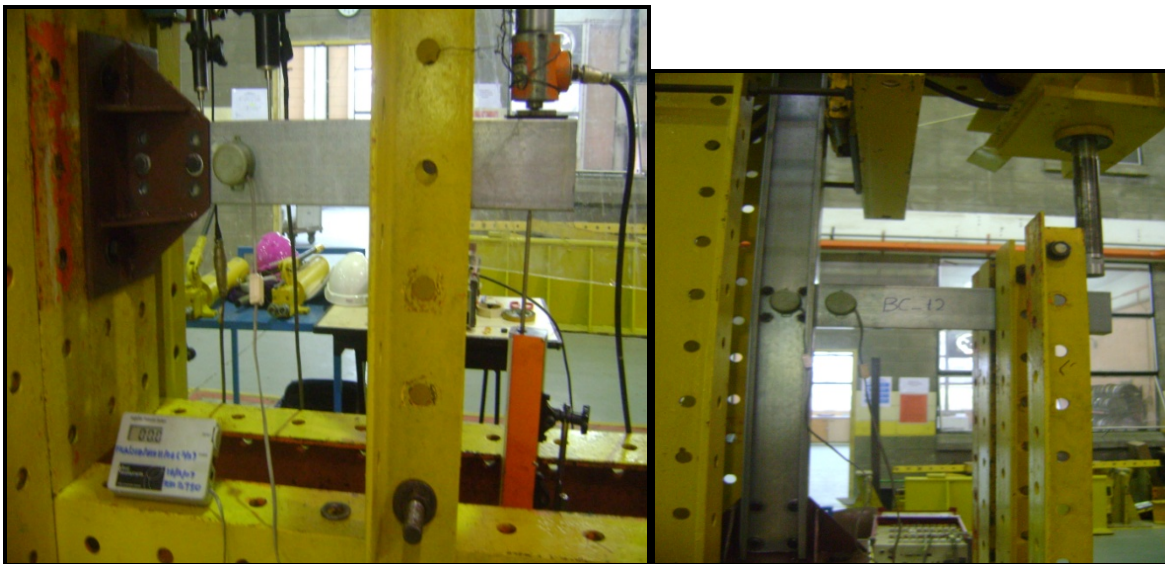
Actual specimen layout for column-base connection (left) and beam-column connections (right)
